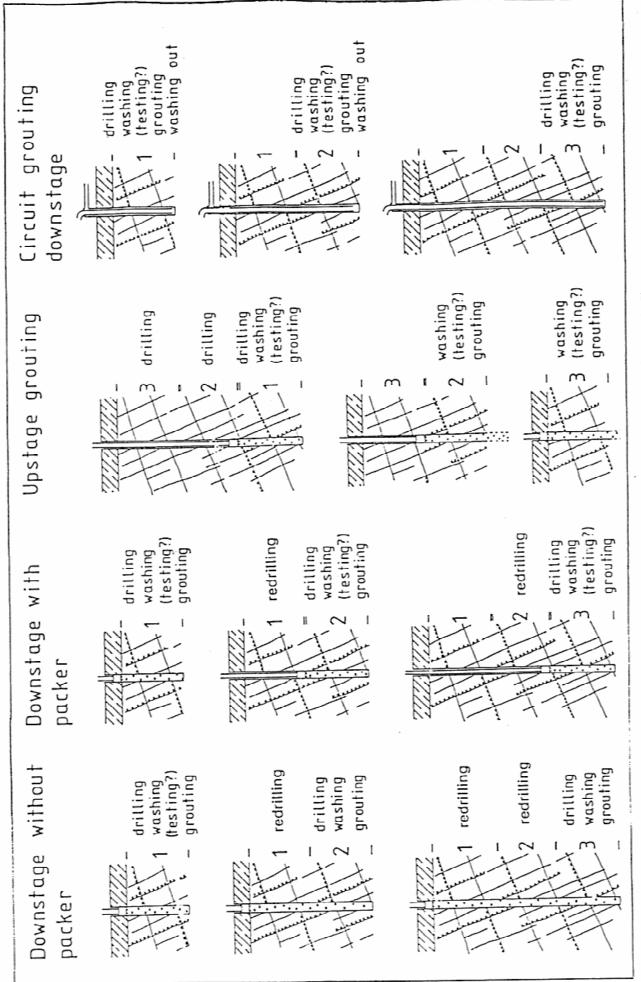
Conventional stage grouting methods for rock fissure grouting (Ewart, 1985 after Houlsby, 1982)
